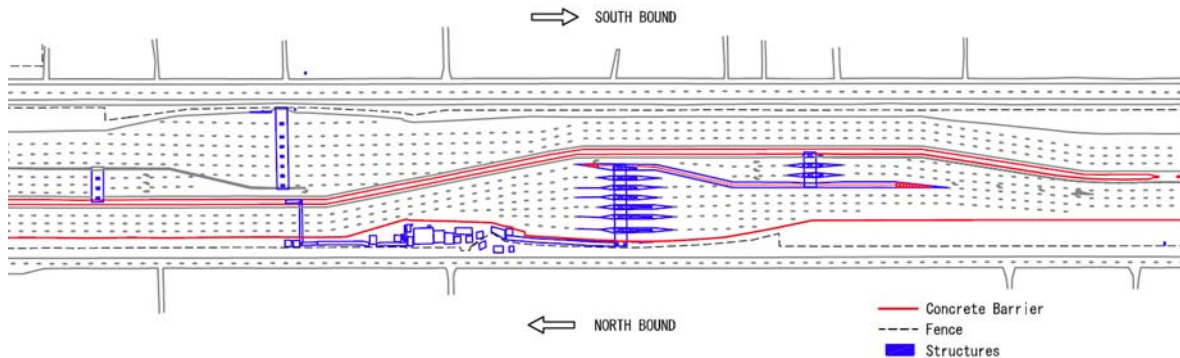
Condition of Toll Gate Plaza • Staggering Booths Layout
